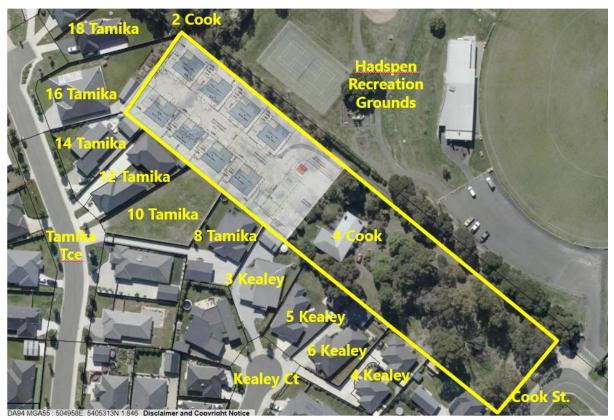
Site plan of new dwellings overlaid onto aerial image (source ListMap) identifying subject site and surrounding properties.
